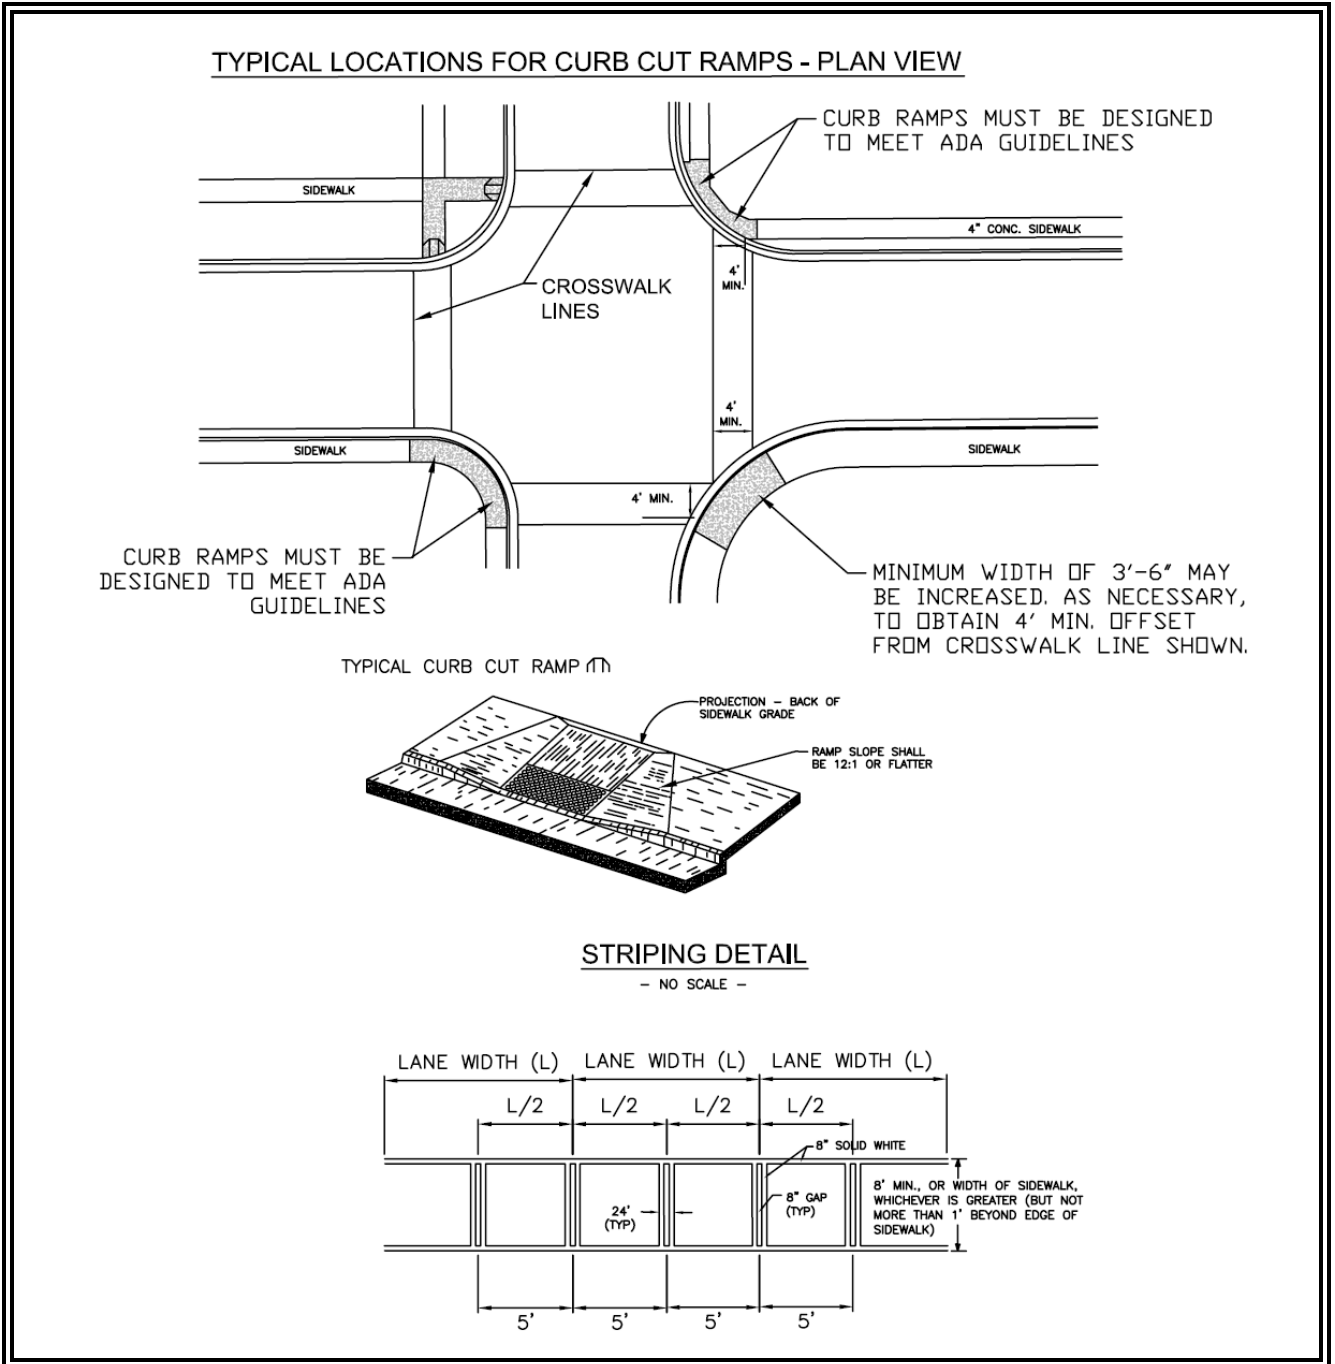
TYPICAL CROSSWALK DETAILS
